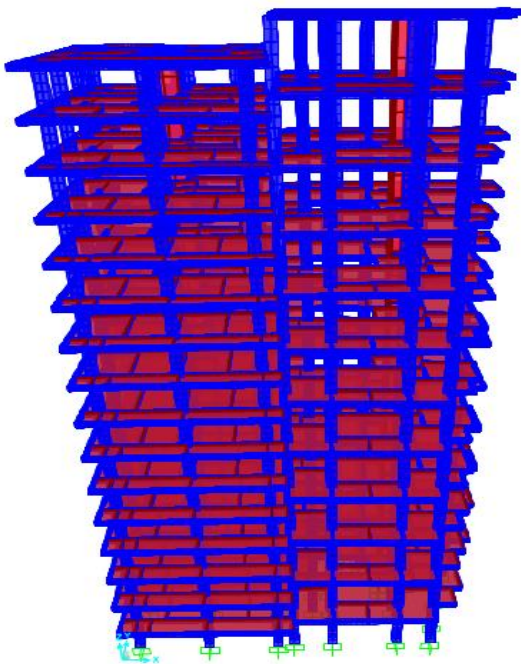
3D View of G+15 building with 3.2m floor to floor height & G+11 buildings with 4.5m floor to floor height without FVD
